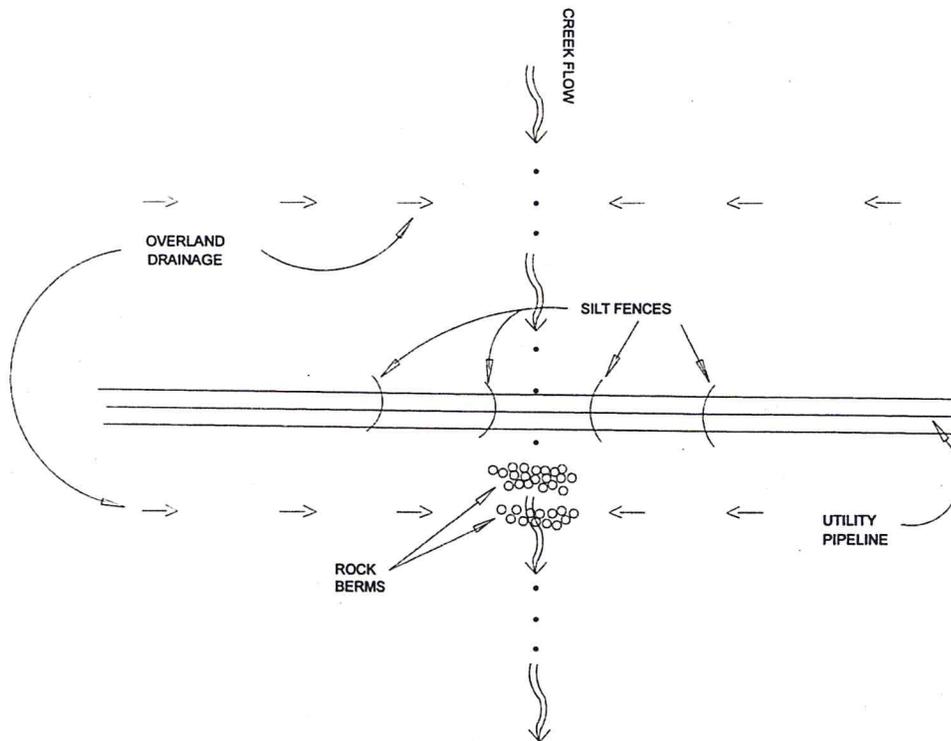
Utility Crossing or Excavation within Creek Schematic
